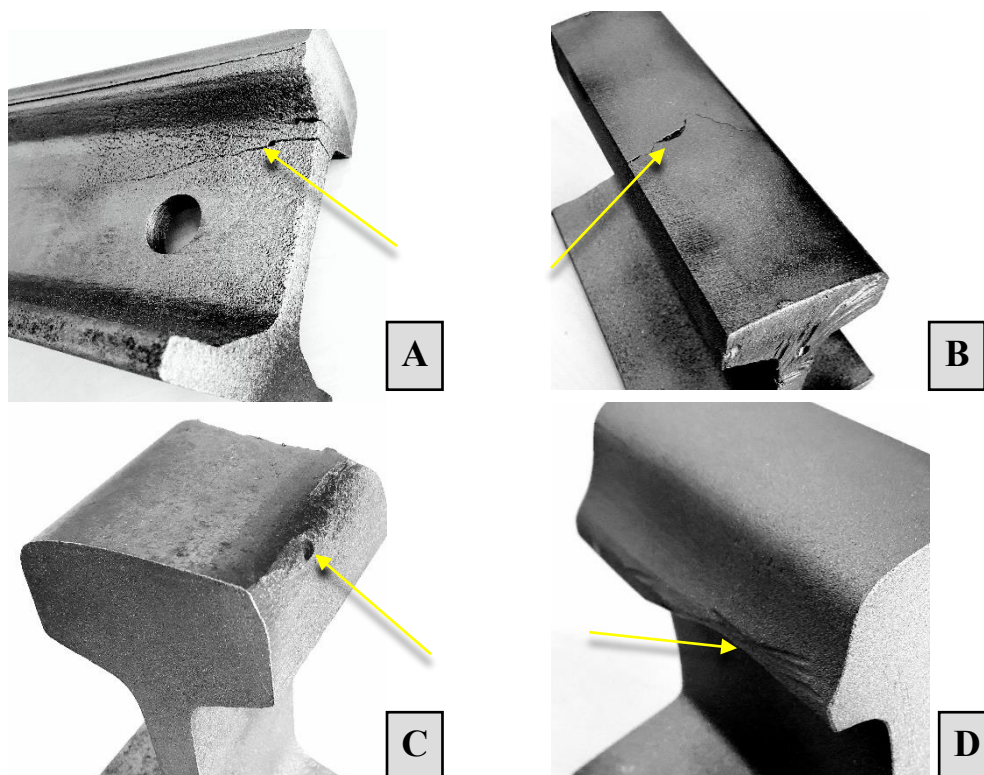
Examples of railhead degradation. A: Fracture near bolt hole of the welding plate, B: railhead surface fracture, C: surface squats at rail contact area, D: exfoliation of railhead.
